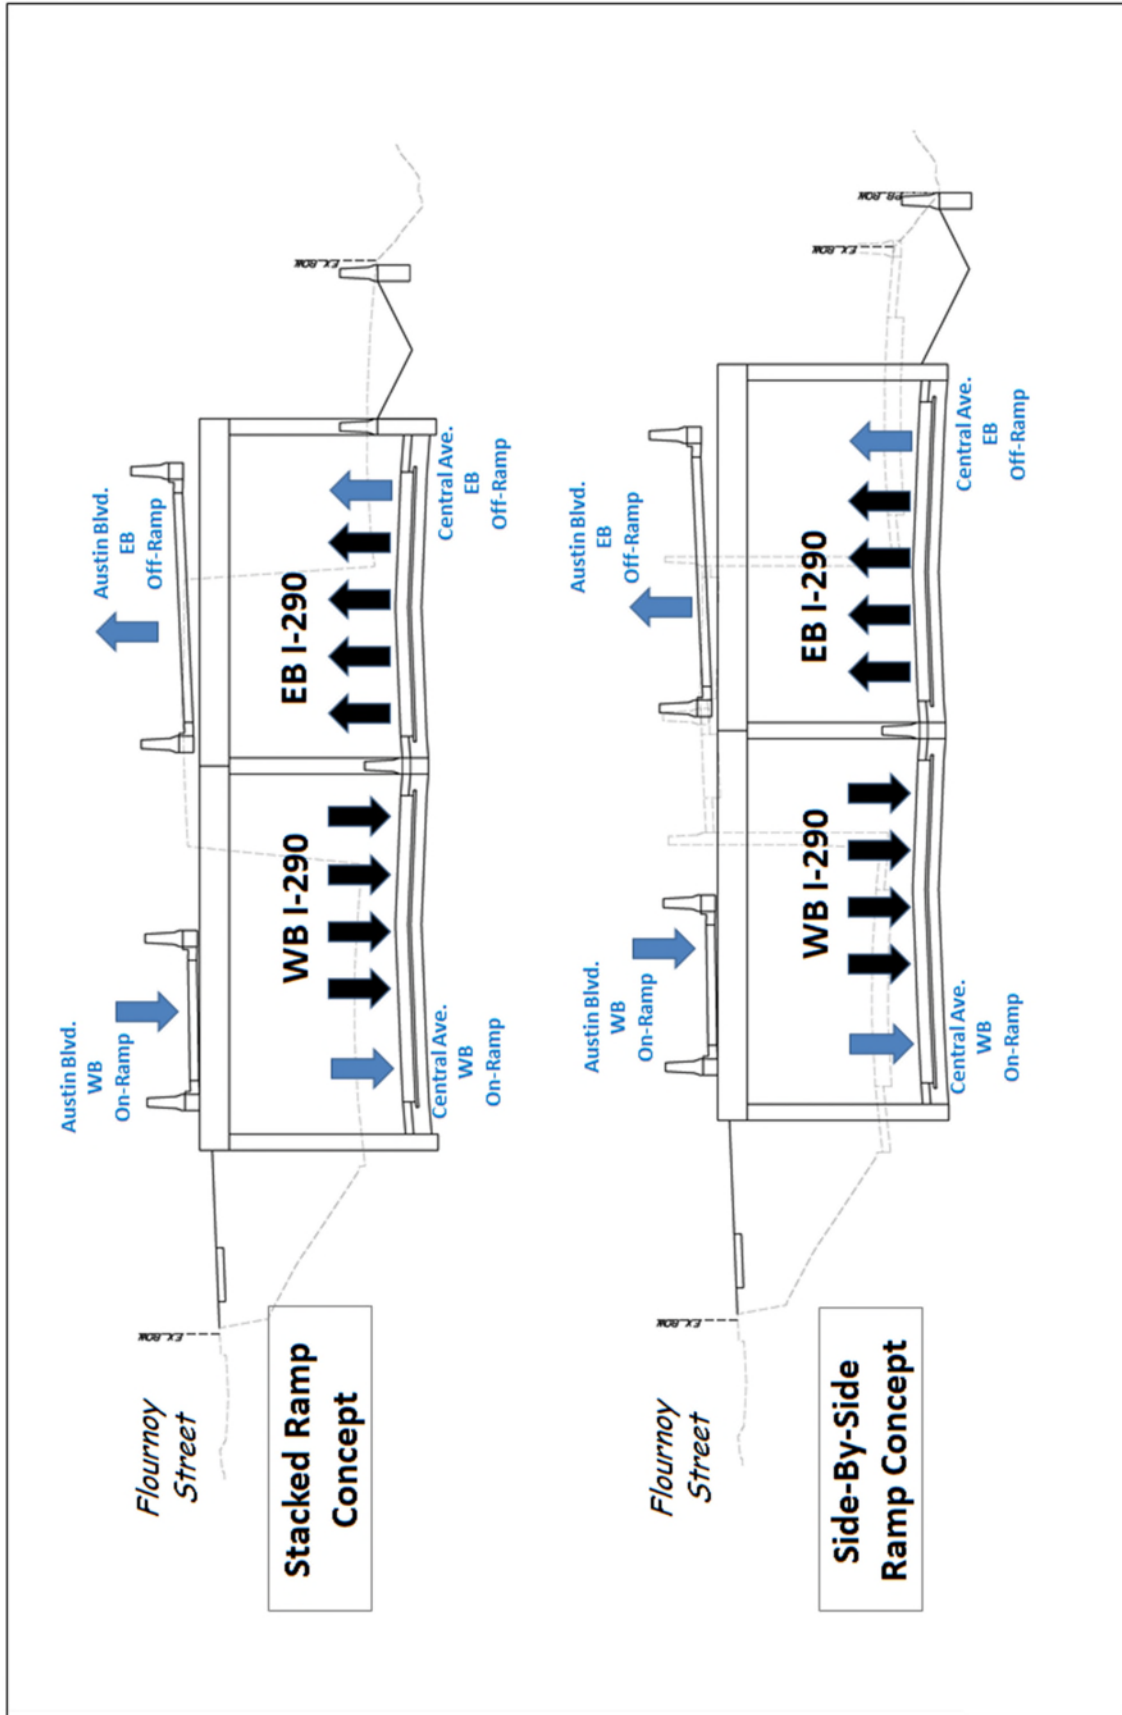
I-290 Cross-section Near Noise Study Location M1
